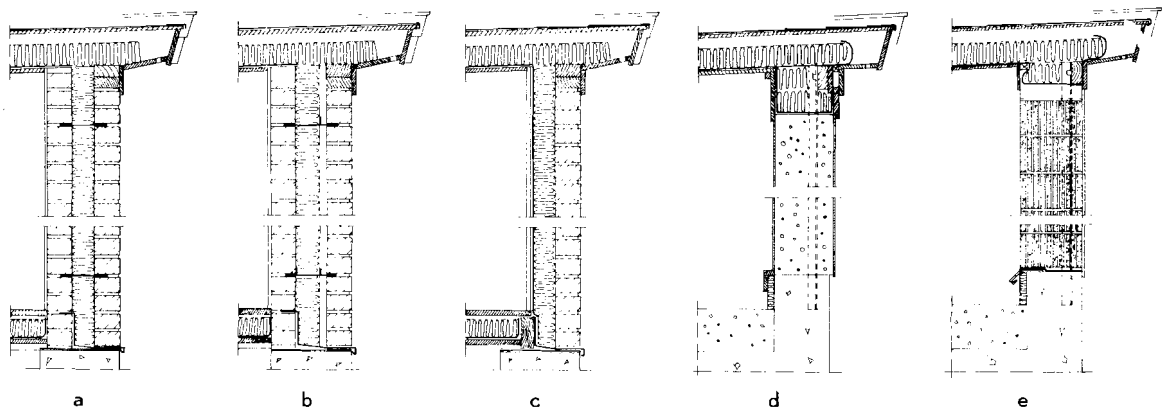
Vertical cross sections of the test panels. a. Cavity brick wall (Cavity filled with insulation material), b. Cavity brick wall (Cavity partly filled with mineral wool insulation), c. Brick veneer wall, d. Test panel of lightweight concrete, e. Test panel of hollow concrete blocks.
